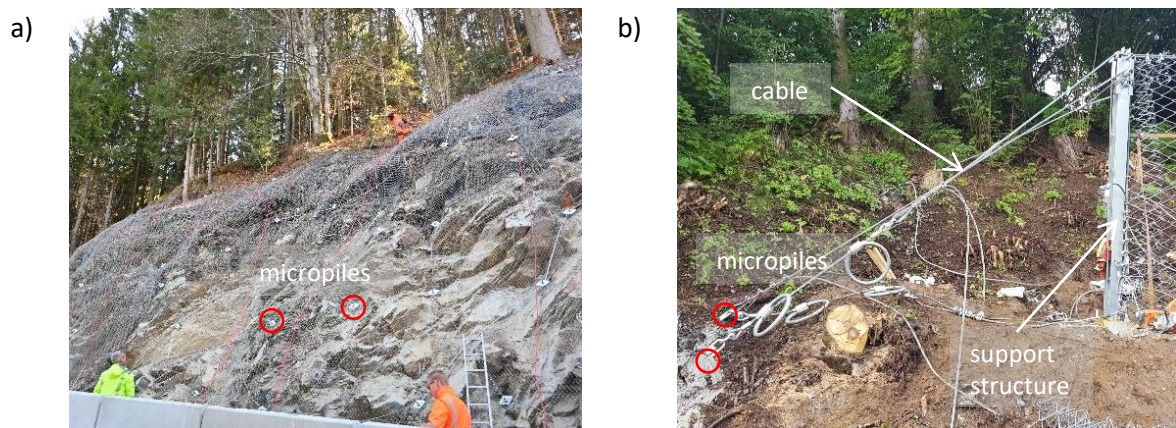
Areas of application of micropiles in hazard protection, rock slope stabilisation (a), cable suspension for rockfall protection structures (b).
